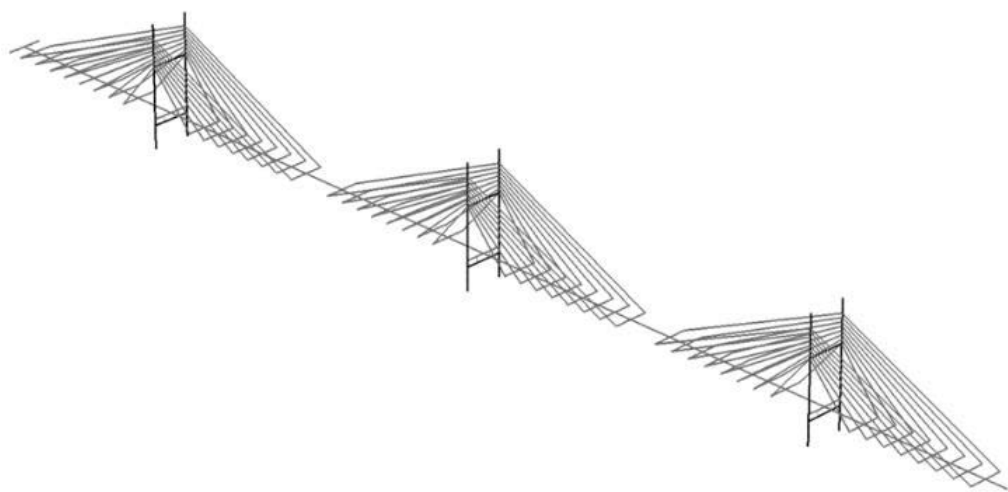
Frame finite element model of a multi-span cable stayed bridge (Okamoto and Nakamura, 2011).
